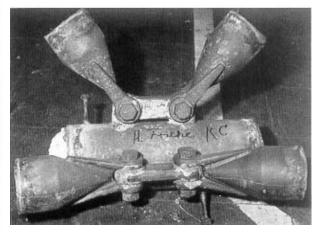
High voltage transmission tower. External view of the cut out joint sample.
